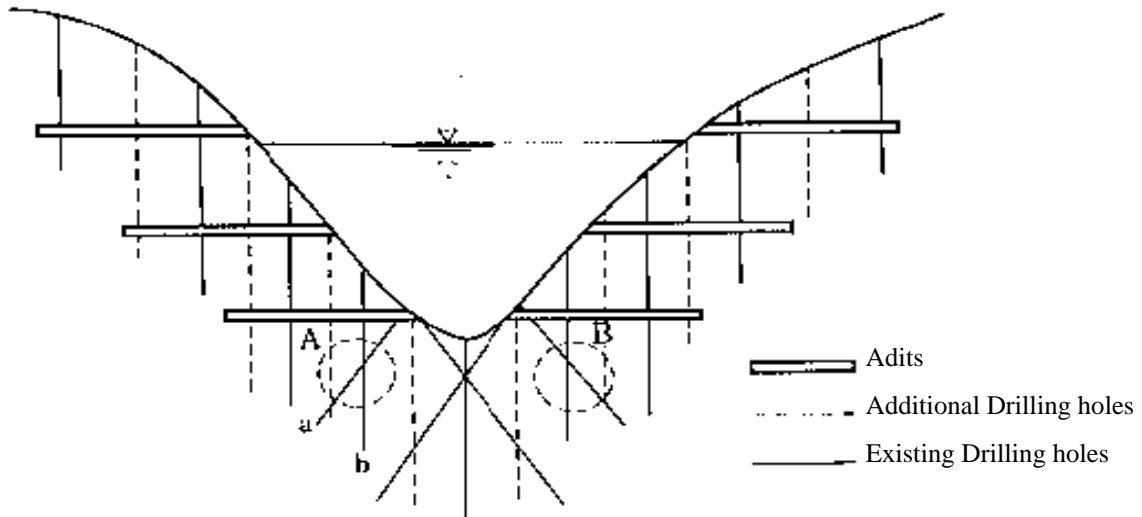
Example of Layout of Adits, Drilling Holes and Seismic Prospecting
